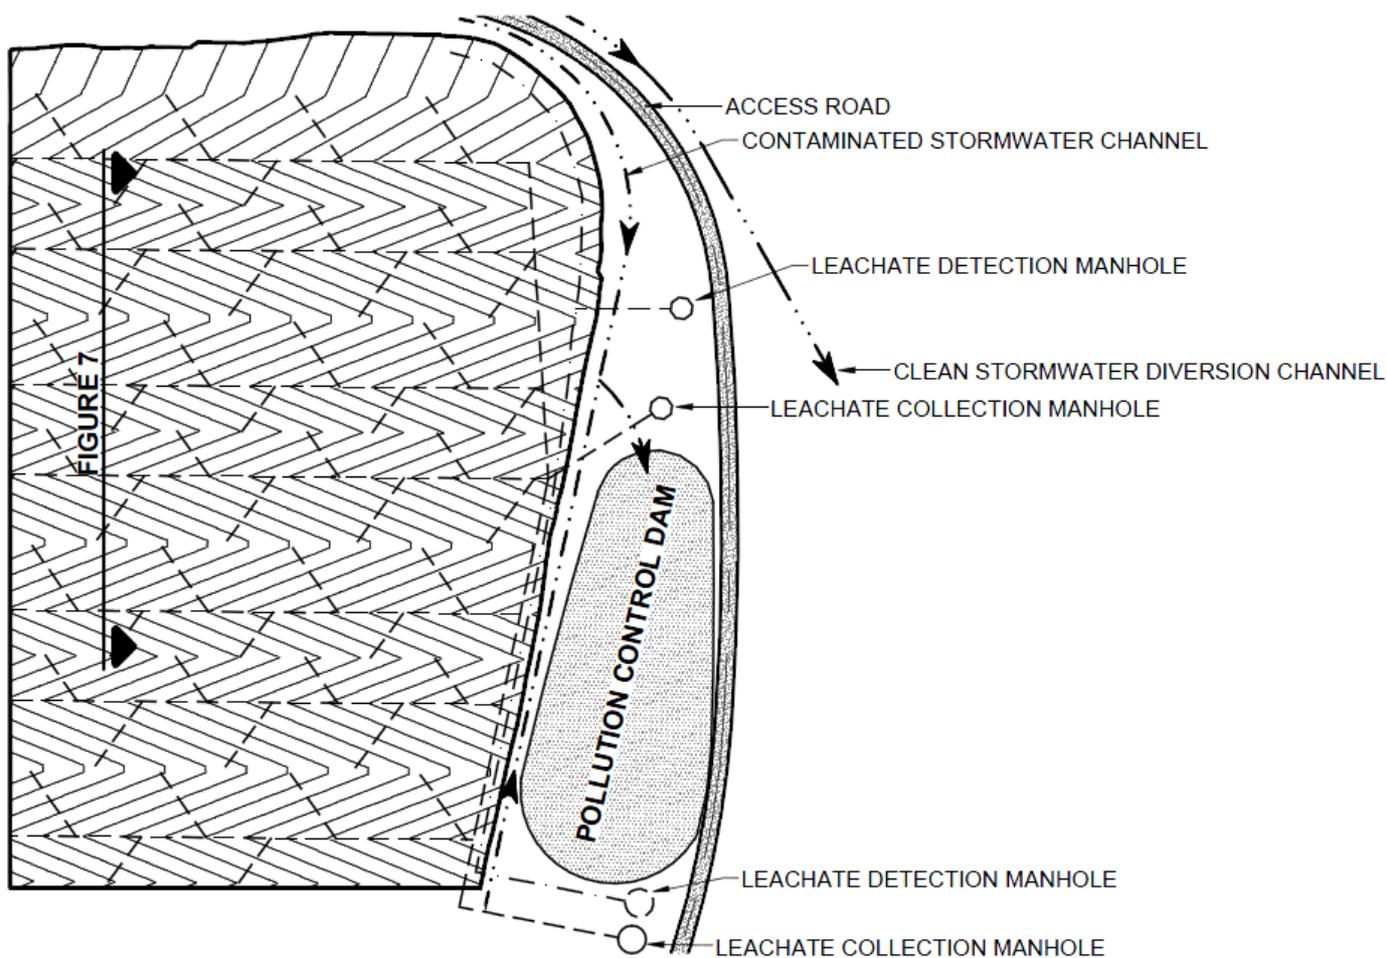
Herringbone Arrangement of Leachate Collection Pipes
